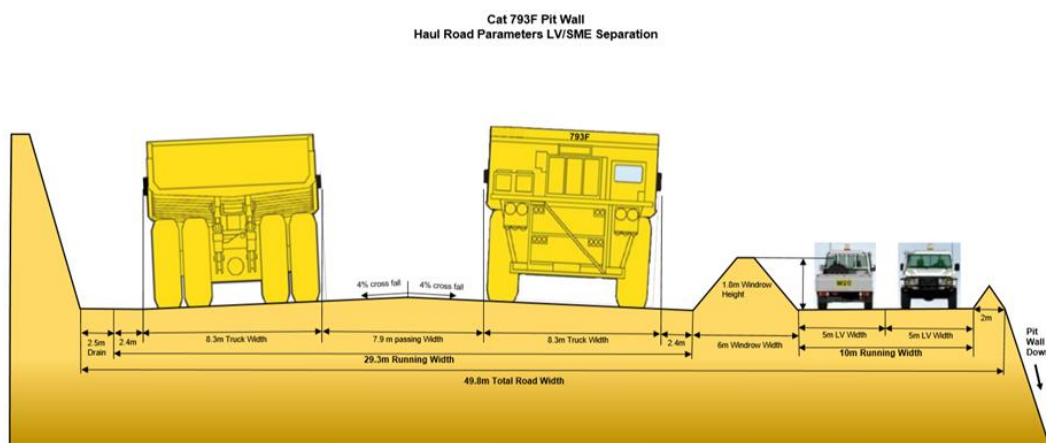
CAT 793F Pit Wall (Haul Road Parameters LV/SME Separation)
